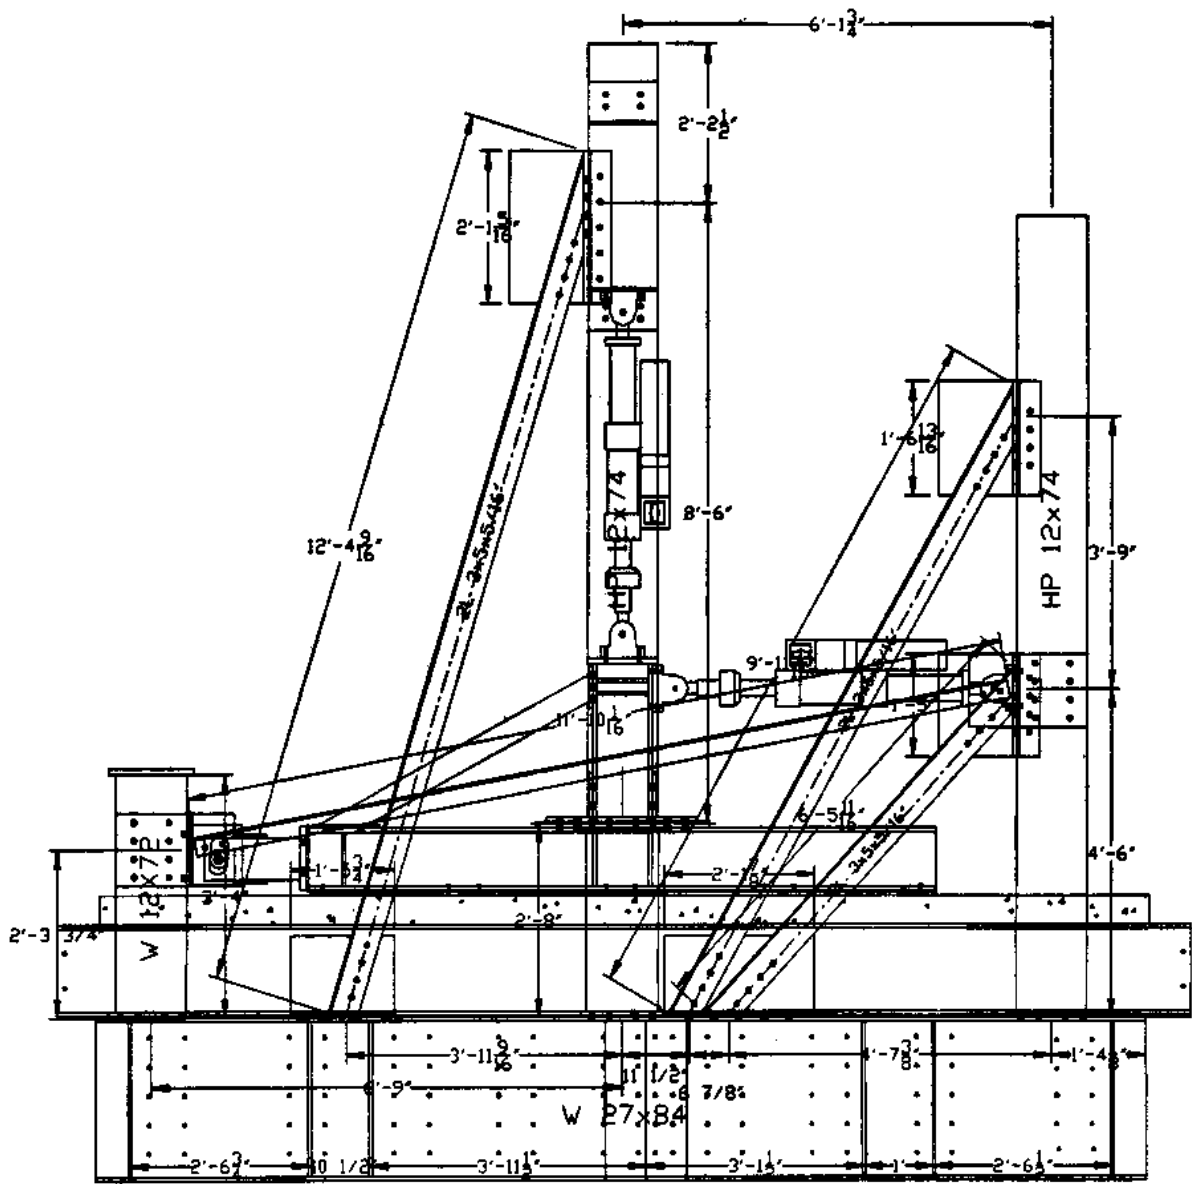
LONGITUDINAL ELEVATION OF MINNE-ALF TEST FACILITY [12]
